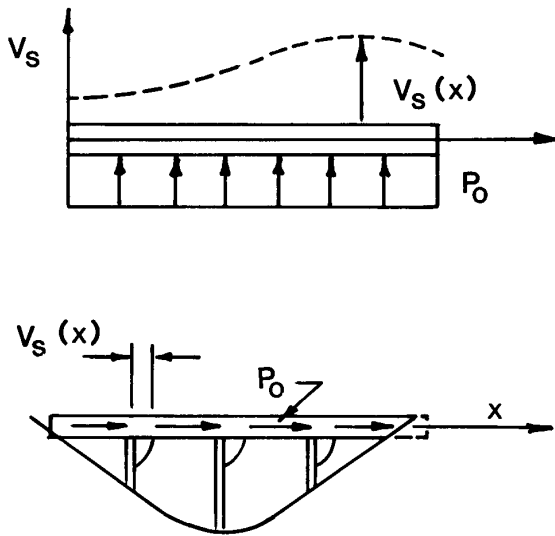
Bridge Deck Subjected to Assumed Transverse and Longitudinal Loading
